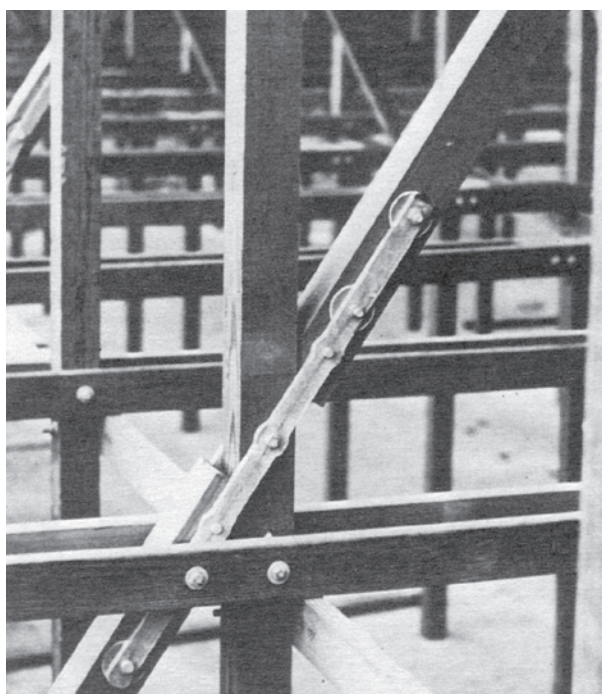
Framework and joint detail in a well-designed cooling tower of wood construction.
